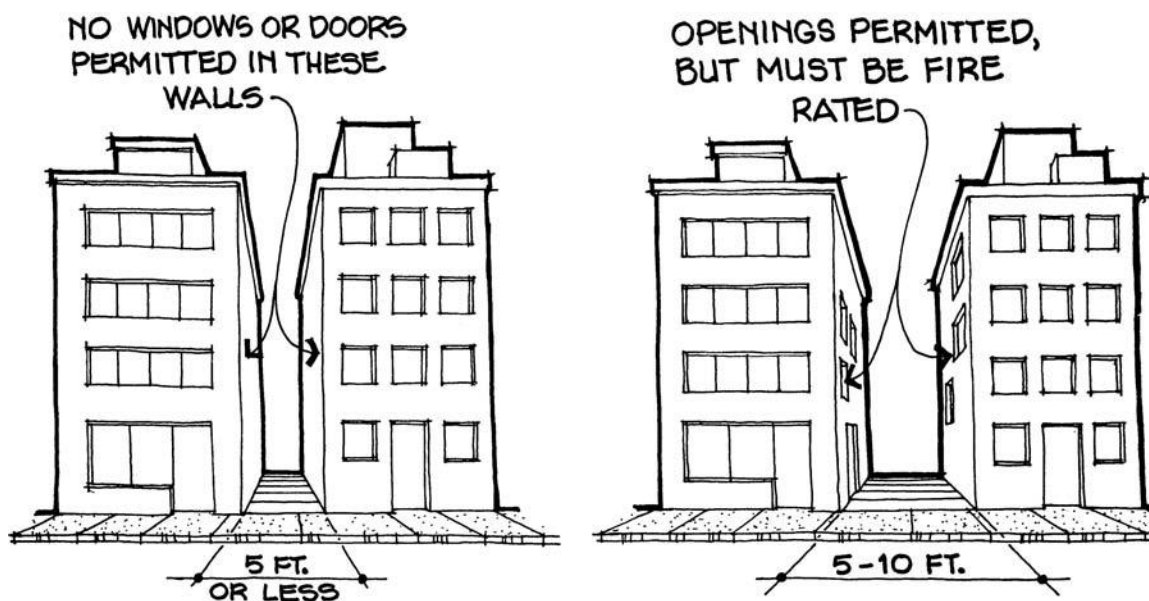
Building codes set minimum distances between buildings where any openings must be fire rated or not permitted.
